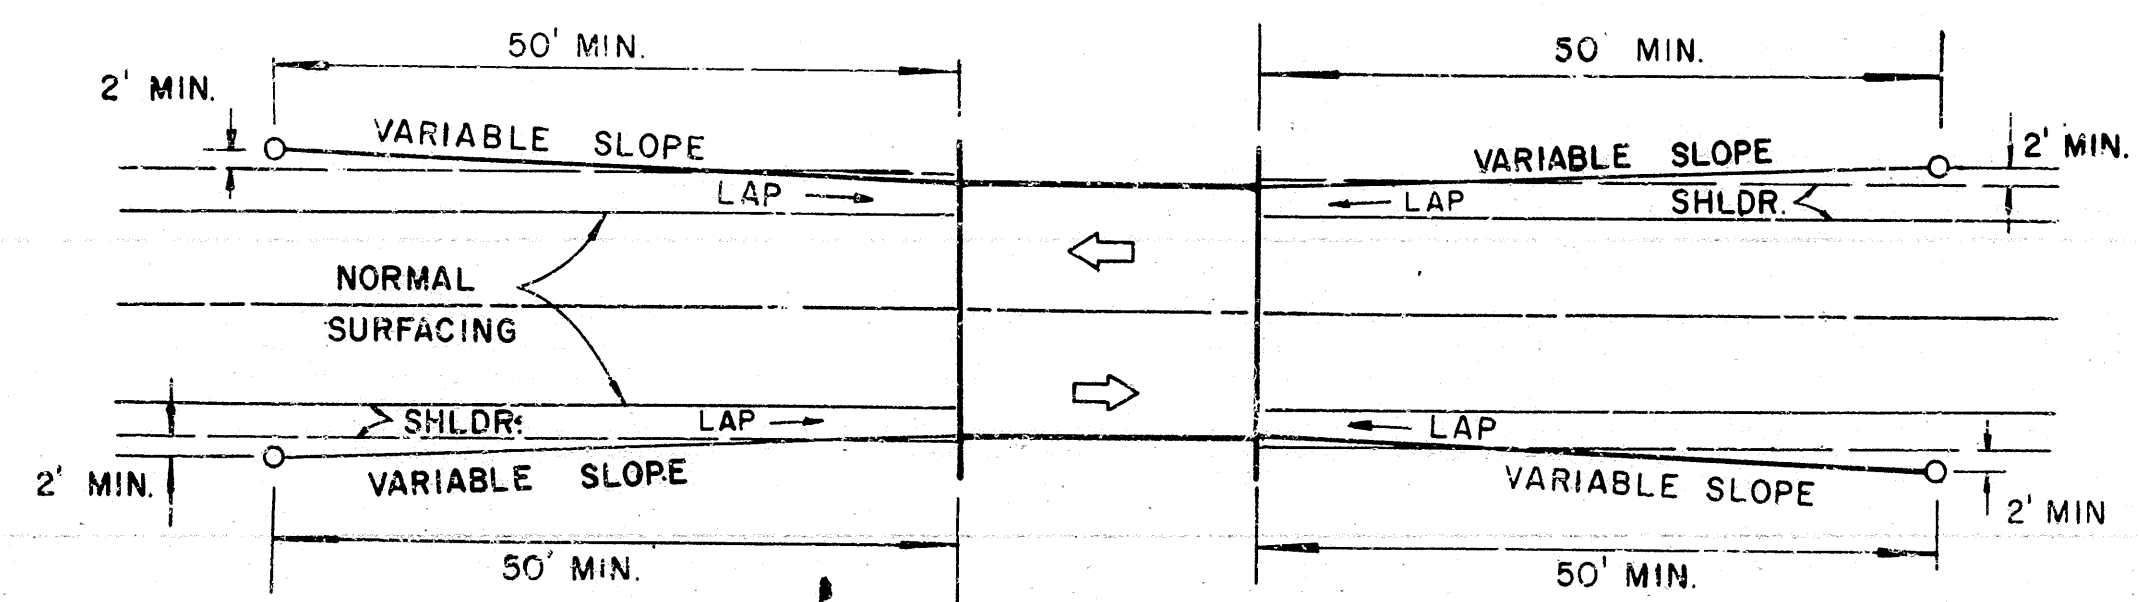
DETAILS OF GUARD RAIL AT BRIDGE ENDS USING GUARD RAIL ANCHOR POSTS
